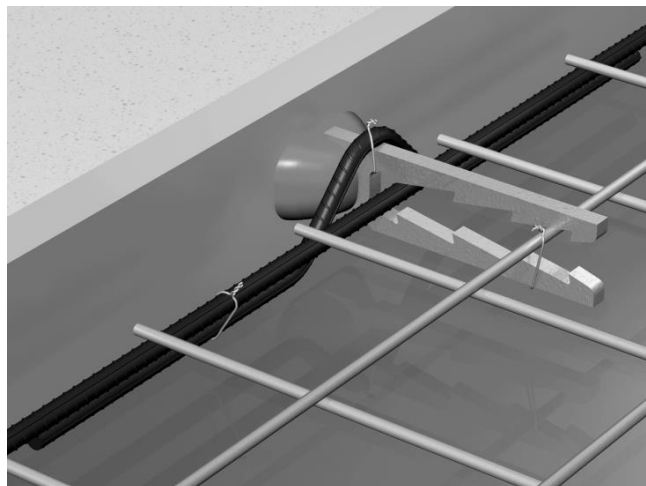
shows the plate Edgelift anchor and the strength contributing steel reinforcement layout, with the anchor void (1), the plate Edgelift anchor (2), tension bar (3), shear bar (4), perimeter bar (5), and panel mesh (6).
